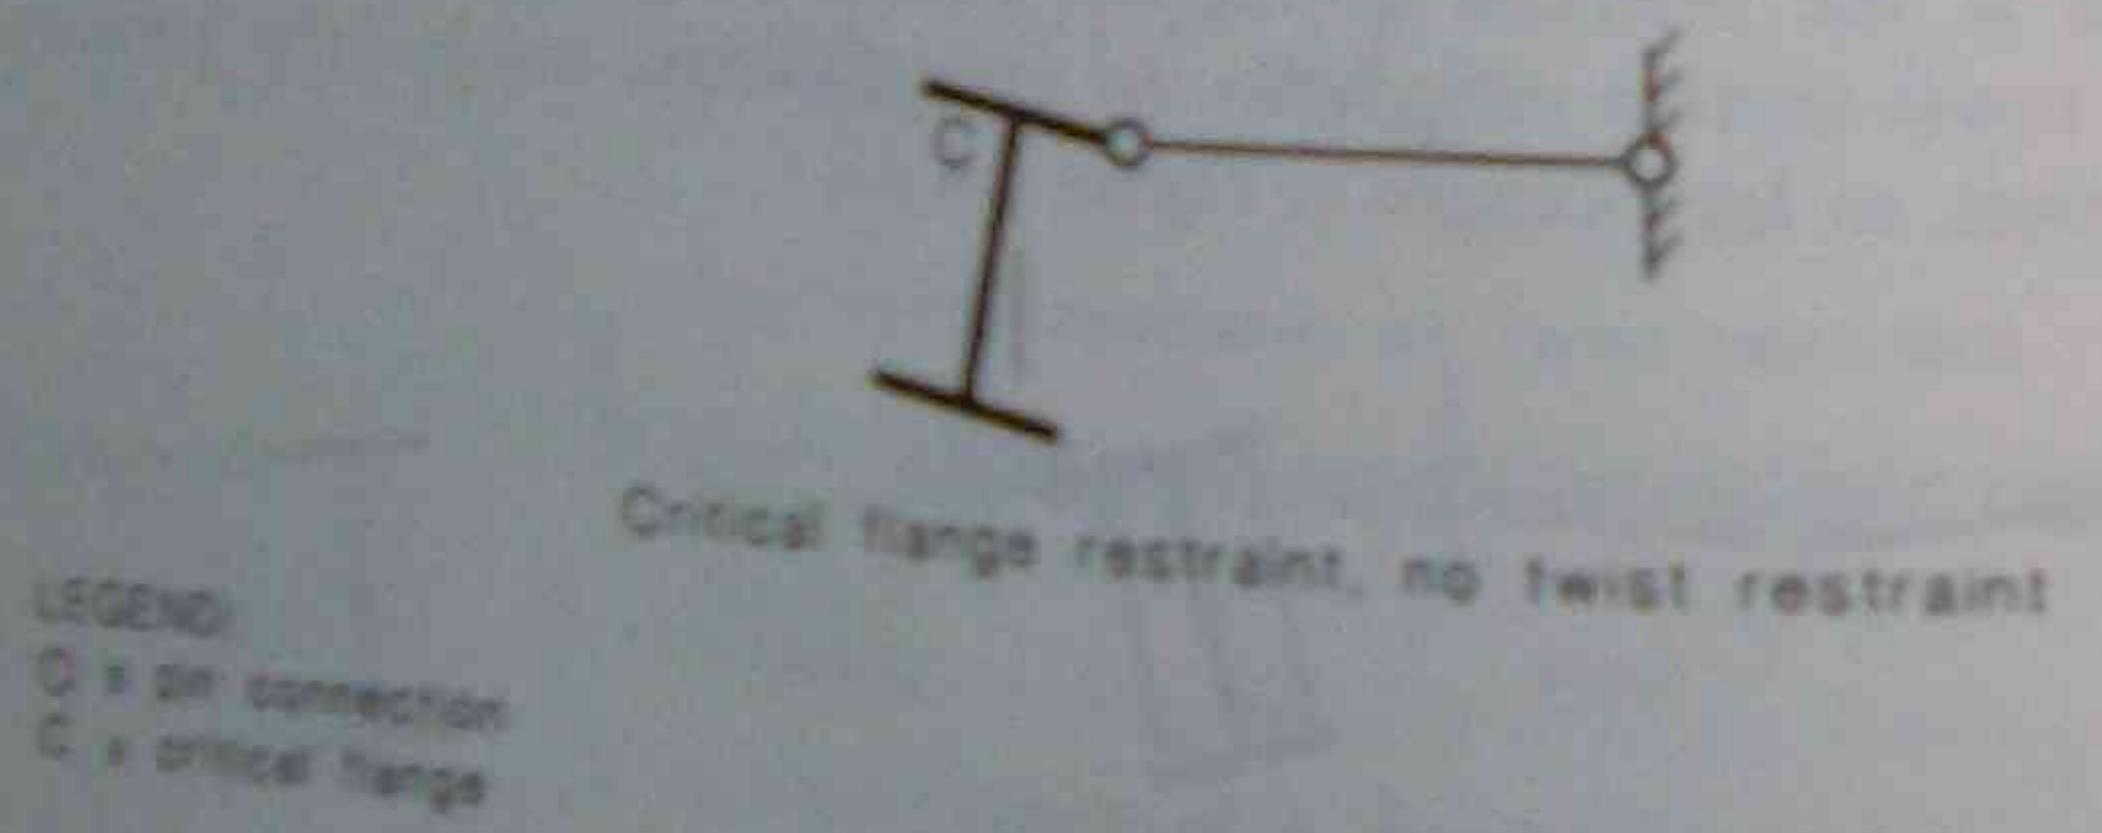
LATERALLY RESTRAINED CROSS-SECTION
